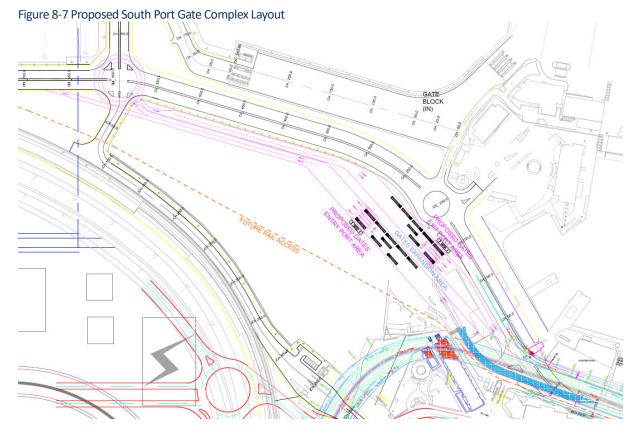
shows a conceptual layout proposal of the entry and exit gate complex at South Port.
